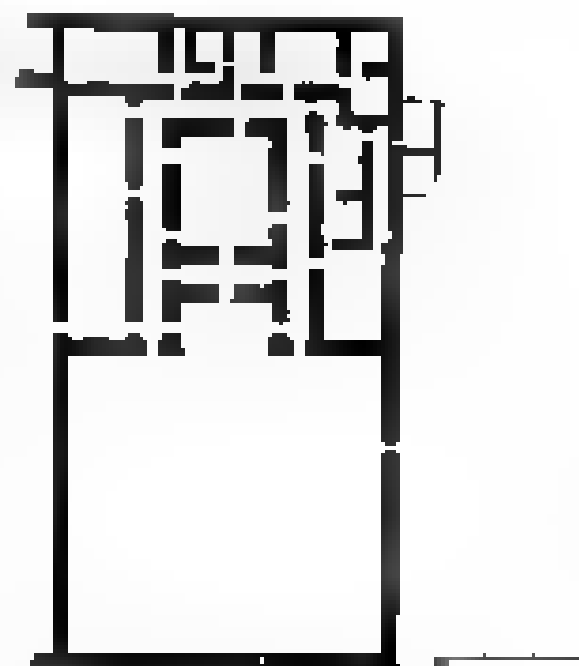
Plan of private house at Khirbat al-Khazim, near Kilehsa Dava
